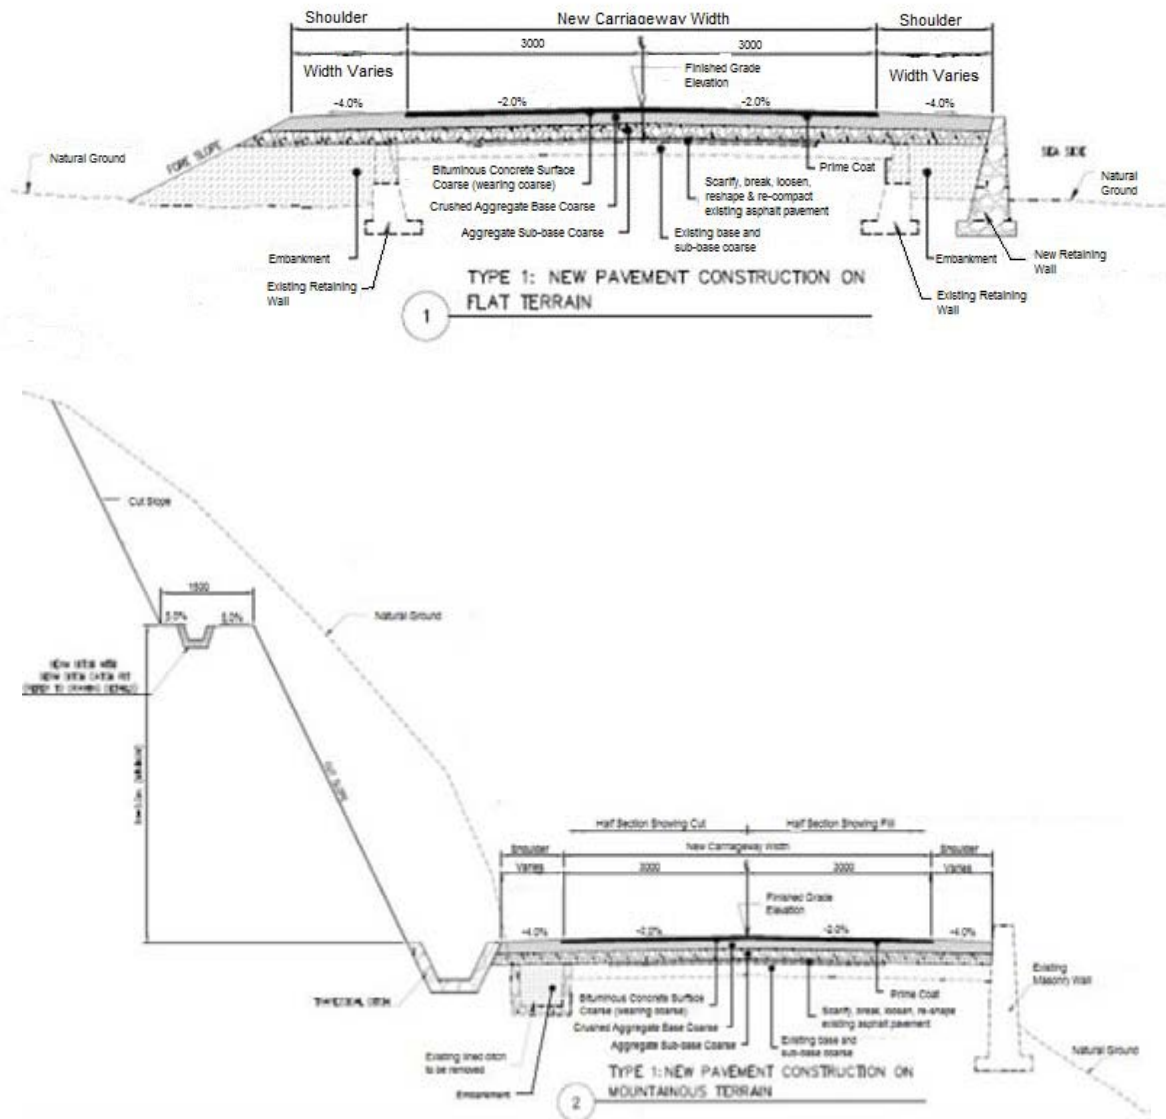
Typical cross section of the 2 types of new pavement construction in Flat Terrain and Mountainous Terrain
